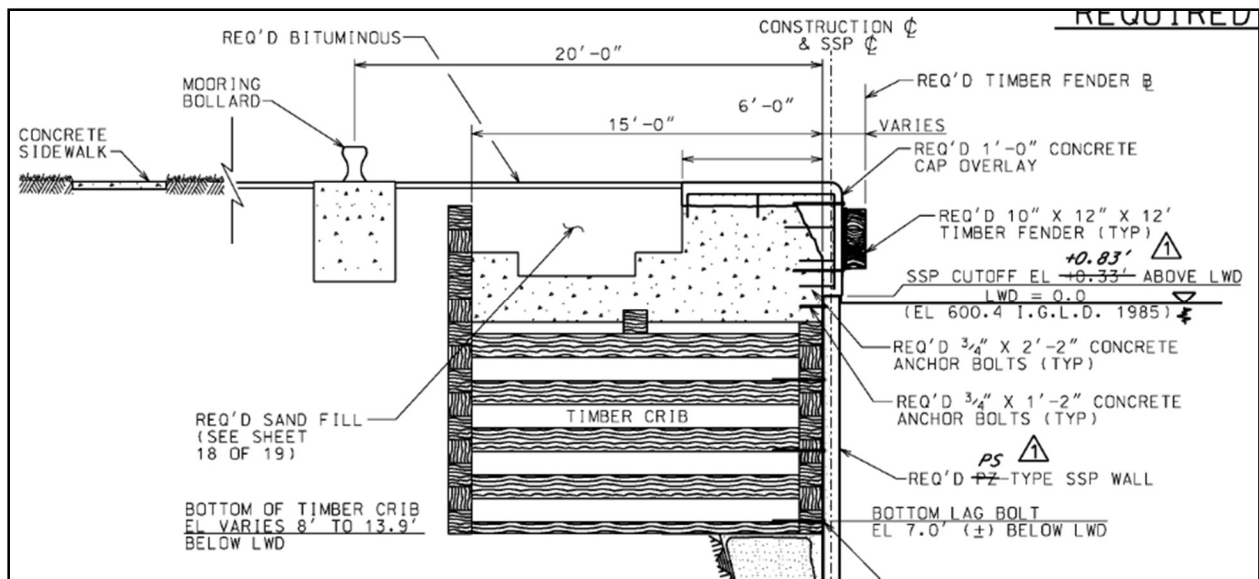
2002 WCP South Wall Rehab (New cap details for Crib 6 showing 1' overlay. PS type SSP wall not part of westernmost 9' of crib 6)
